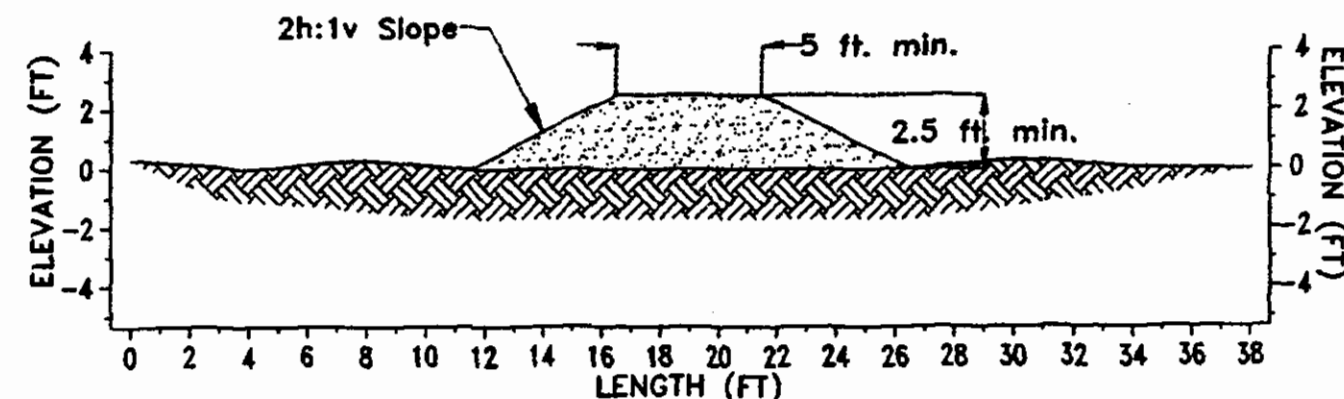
CROSS SECTION OF A BERM (TYPICAL)
